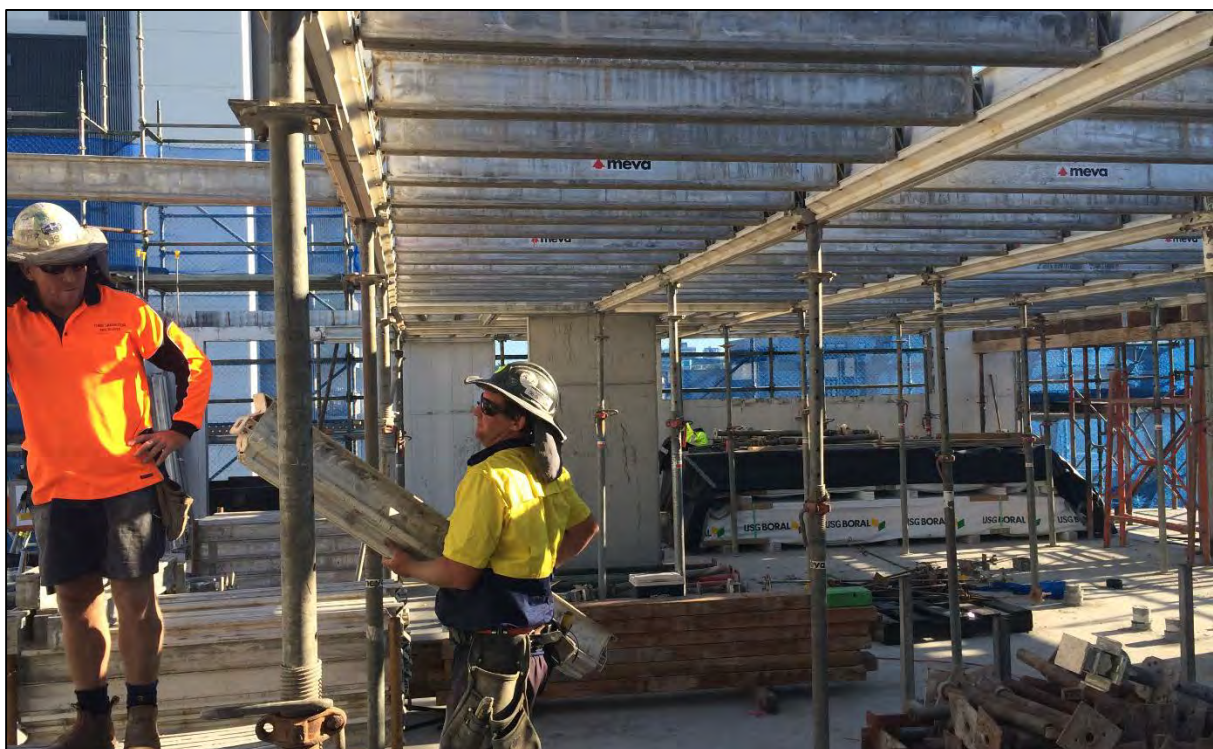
Roof Top – Laborers erecting formwork and supports for the level 7 floor slab.
